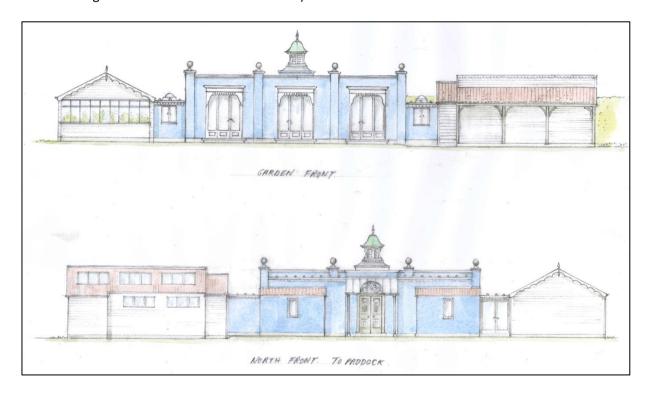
Illustrative Draft Sketches North and South Elevations
